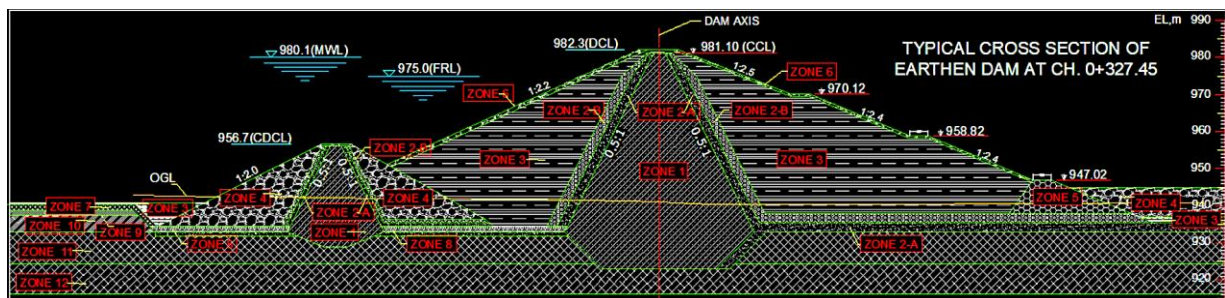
Previous Typical cross-section of Yanda dam at 0+327.5
